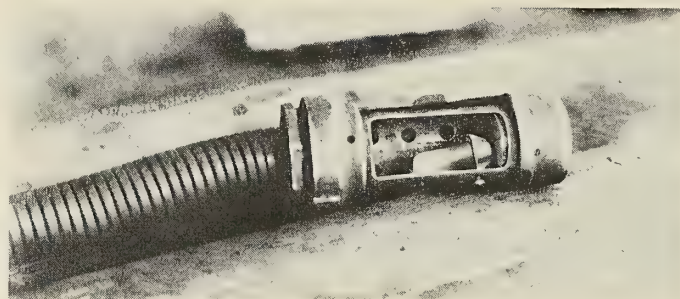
End of Metal Tubing Where Hot Rivet Is Delivered to Riveter
